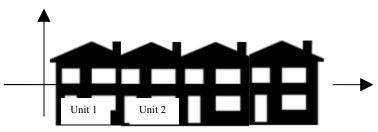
G: Linear Multi-Family Dwelling Arrangement
